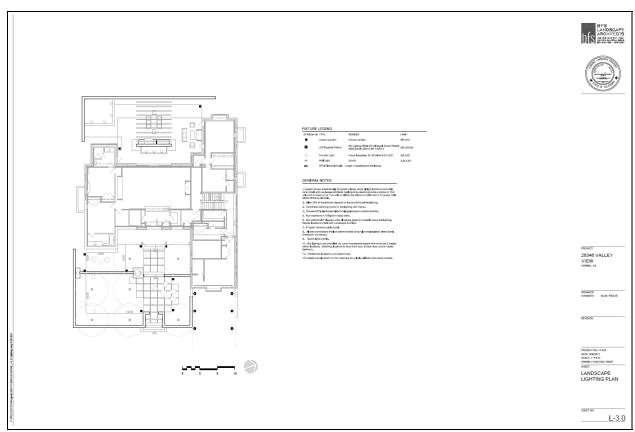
L-3: Proposed Lighting Plan at 26346 Valley View Avenue
